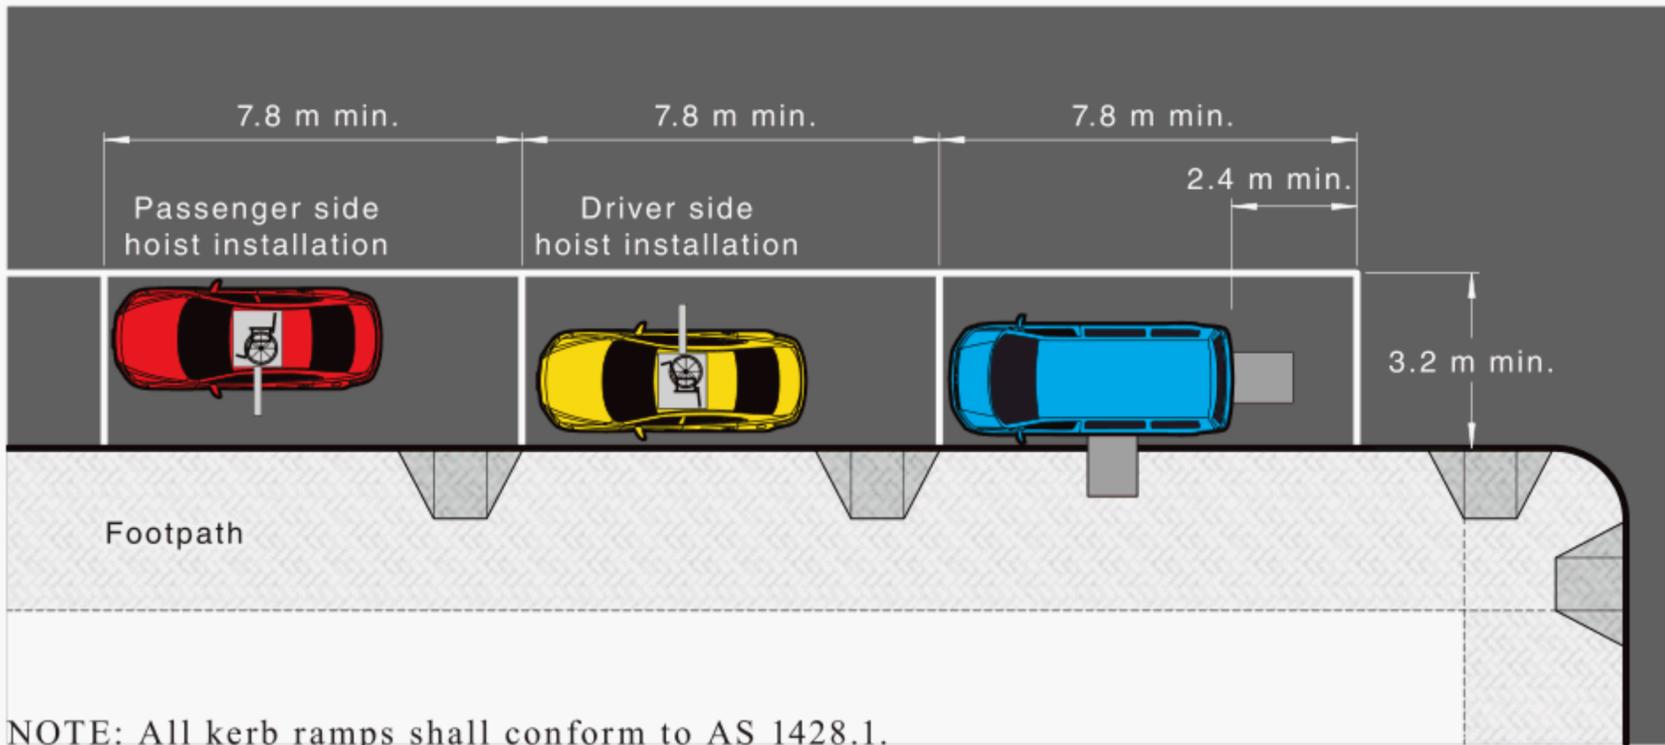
Examples of accessible parallel parking without kerb extensions
